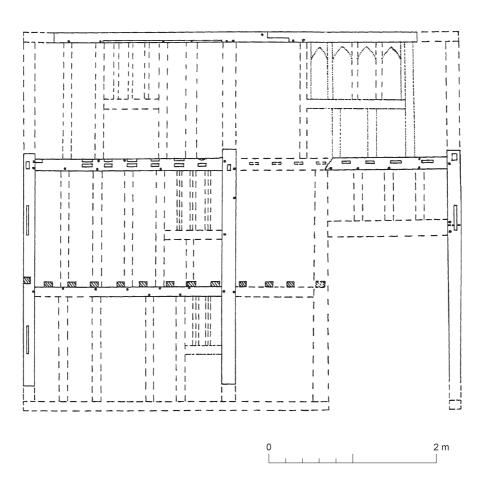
Reconstruction of timber frame of no 3 Queen Street: rear elevation with fragments of elaborate oriel window (by R Shackle).
